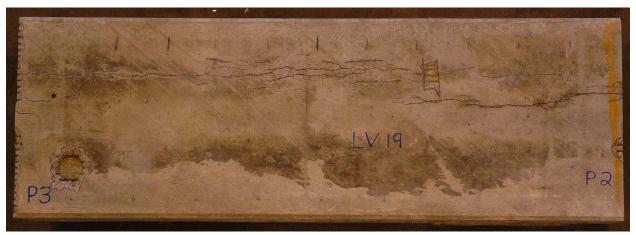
Bottom Flange Crack and Spall Condition Span 3 Beam 19
